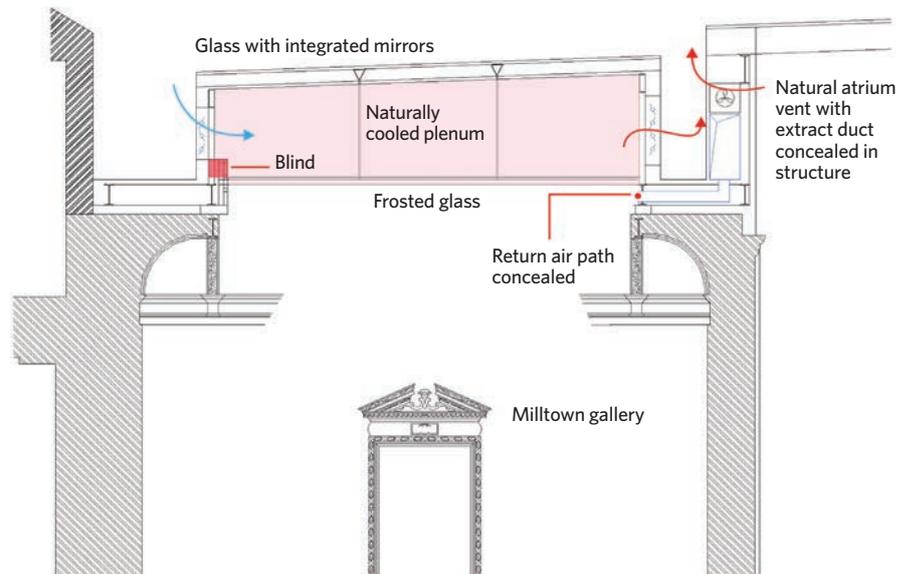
Milltown Gallery showing 'pop-up' roof and ventilation strategy
